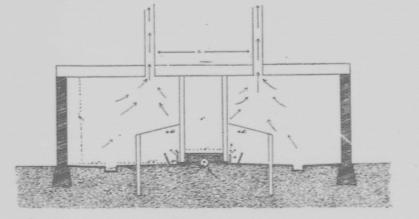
End section of a cattle stable, showing floor, elevated feeding alley, and system of ventilation.
